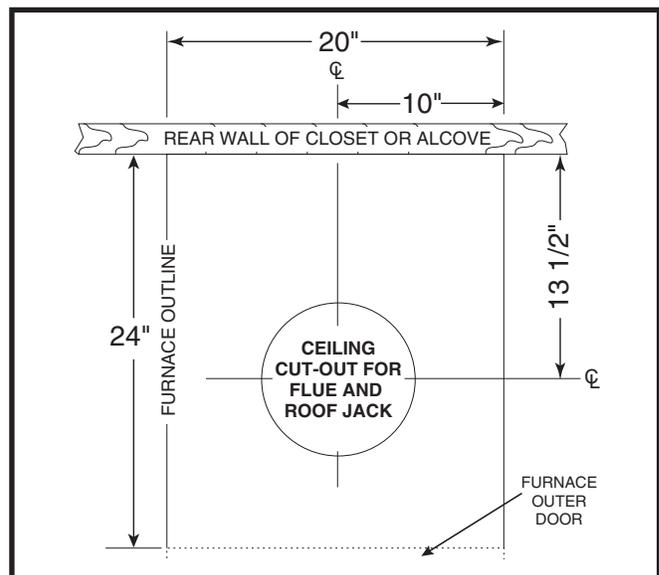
Cut-Out Dimensions for Flue & Roof Jack
